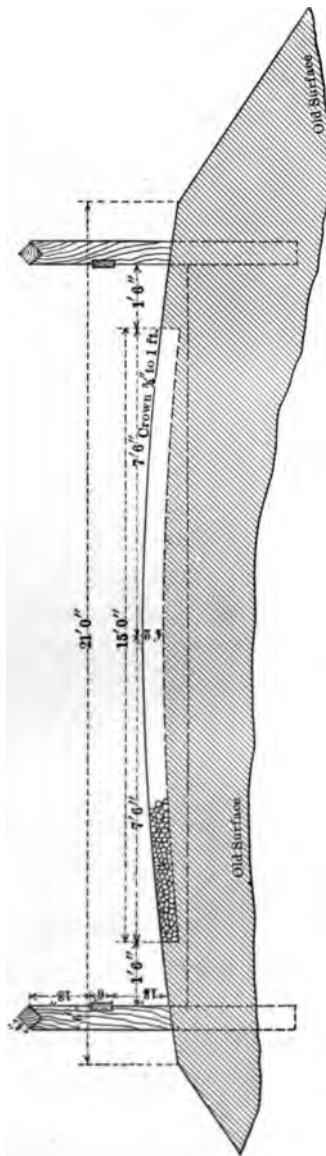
Standard Cross-Section Showing Macadam Pavement with Guard Rail (Mass.).
